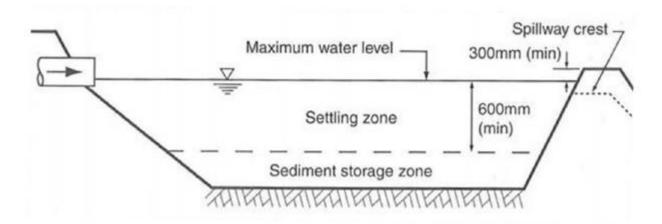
Typical Type D Sediment Basin Cross-Section (source: IECA, 2018)
